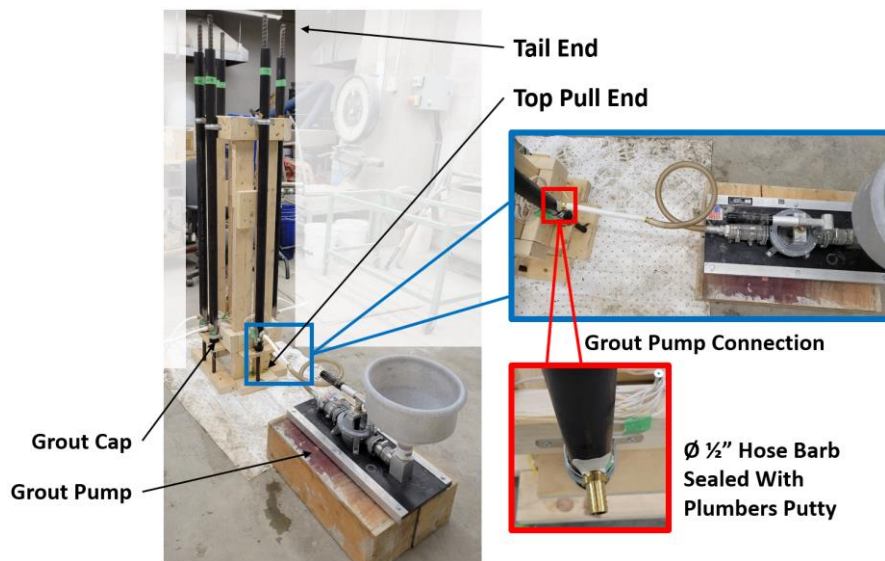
FGRB Specimen installation in grouting rack with grout pump
